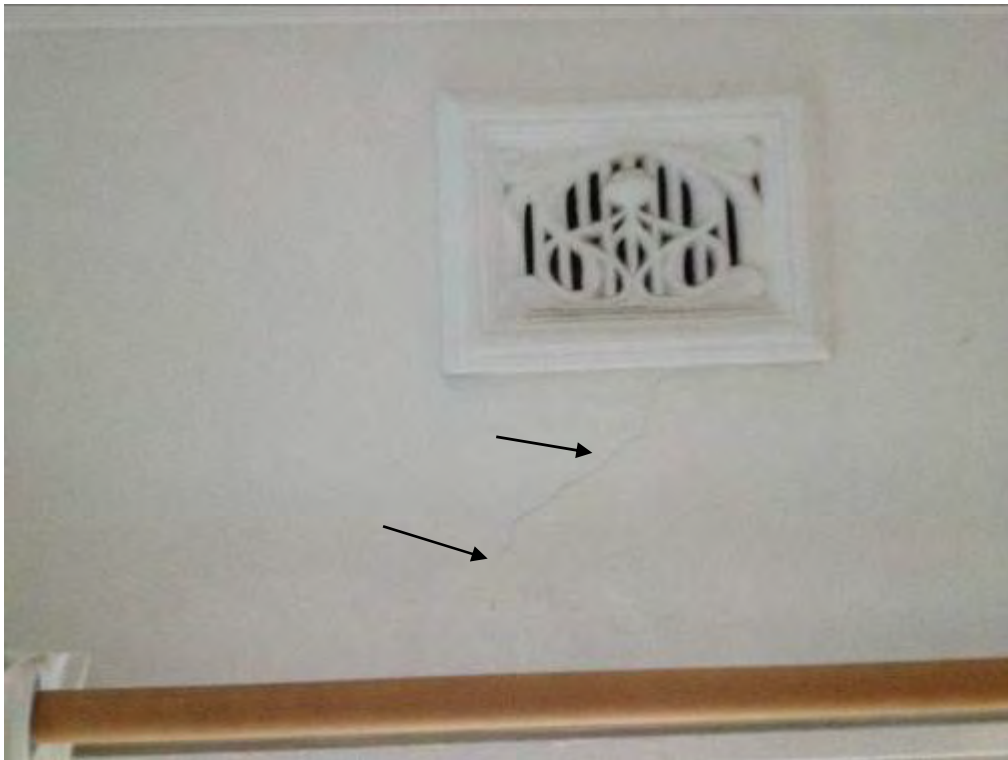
shows a hairline radial crack to the southwest corner of Bedroom 1 ceiling
